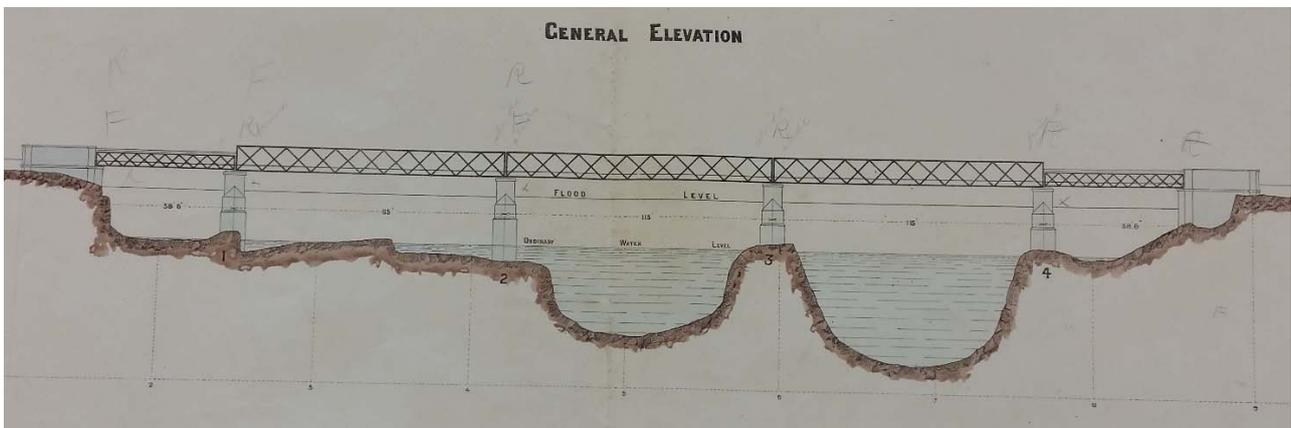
General Elevation of the Beaumont Bridge, 1887.
